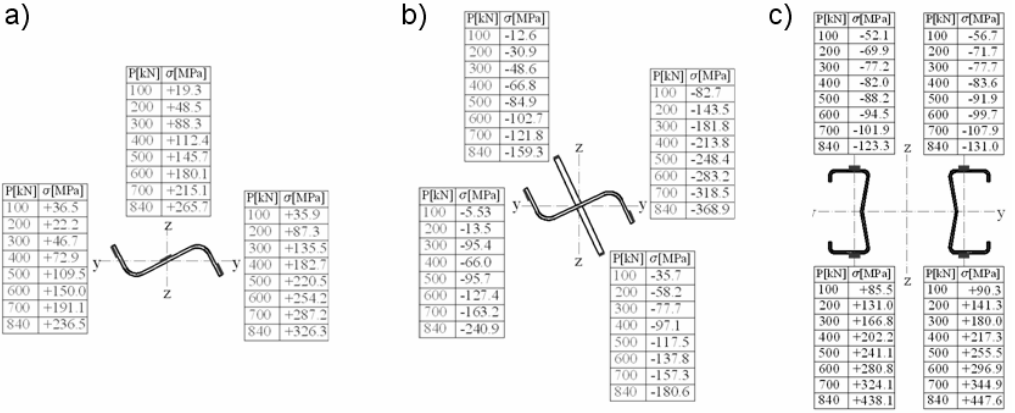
Layouts of gauges and stresses in tension bar (a), compression bar (b) and chord (c)
